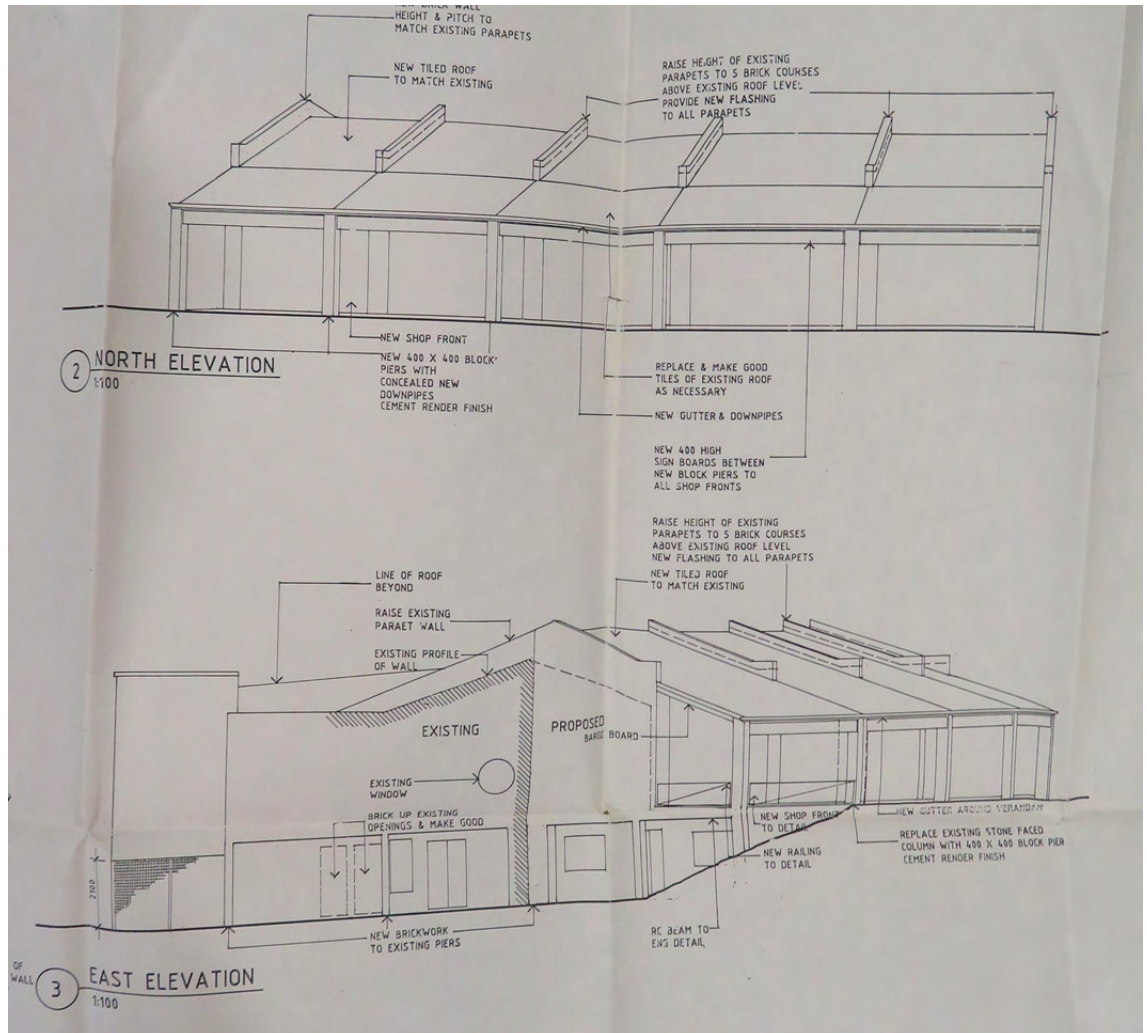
1991 Alterations & Additions to The Griffin Centre, 122-126 Edinburgh Road, Castlecrag by architects, Noel Bell, Ridley Smith & Partners: North & East Elevations.
